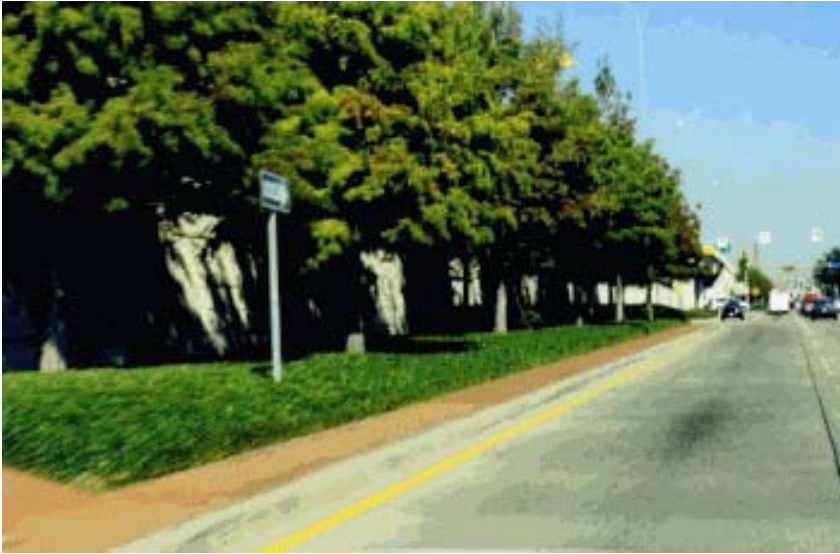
Plants are effective for visually softening tall retaining walls or noise walls.
